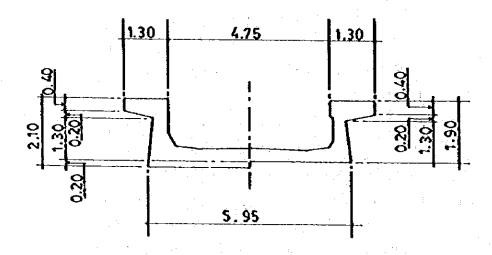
SECTION OF P.C. GIRDER FOR RAILWAY VIADUCT
